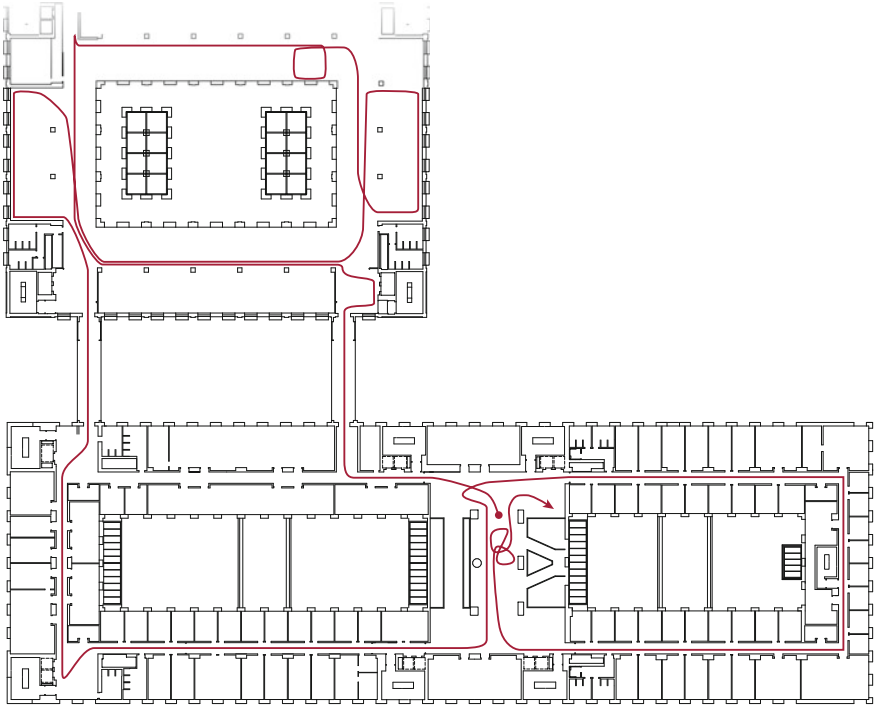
Part of the floor plan of the Bicocca University building, used for gathering the data. While the shown ground truth trajectory is about 740 m long, the extent of the complete floor plan is about 140 m × 240 m
